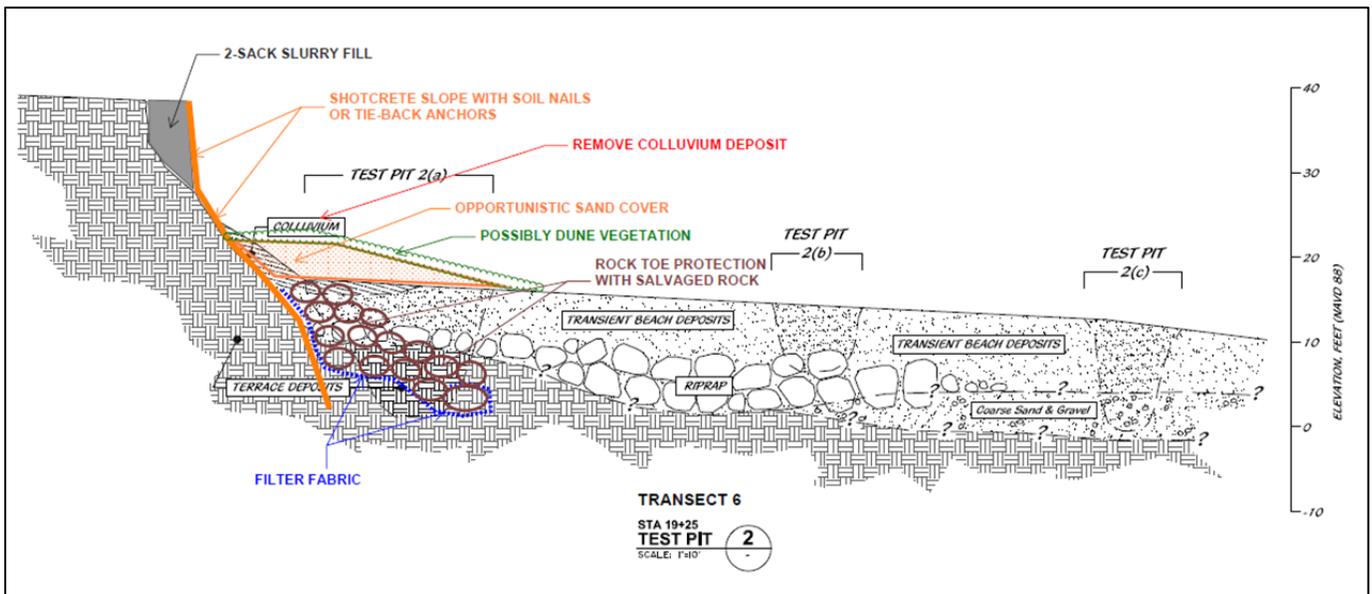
ALTERNATIVE CONCEPT – FULL ARMORING
